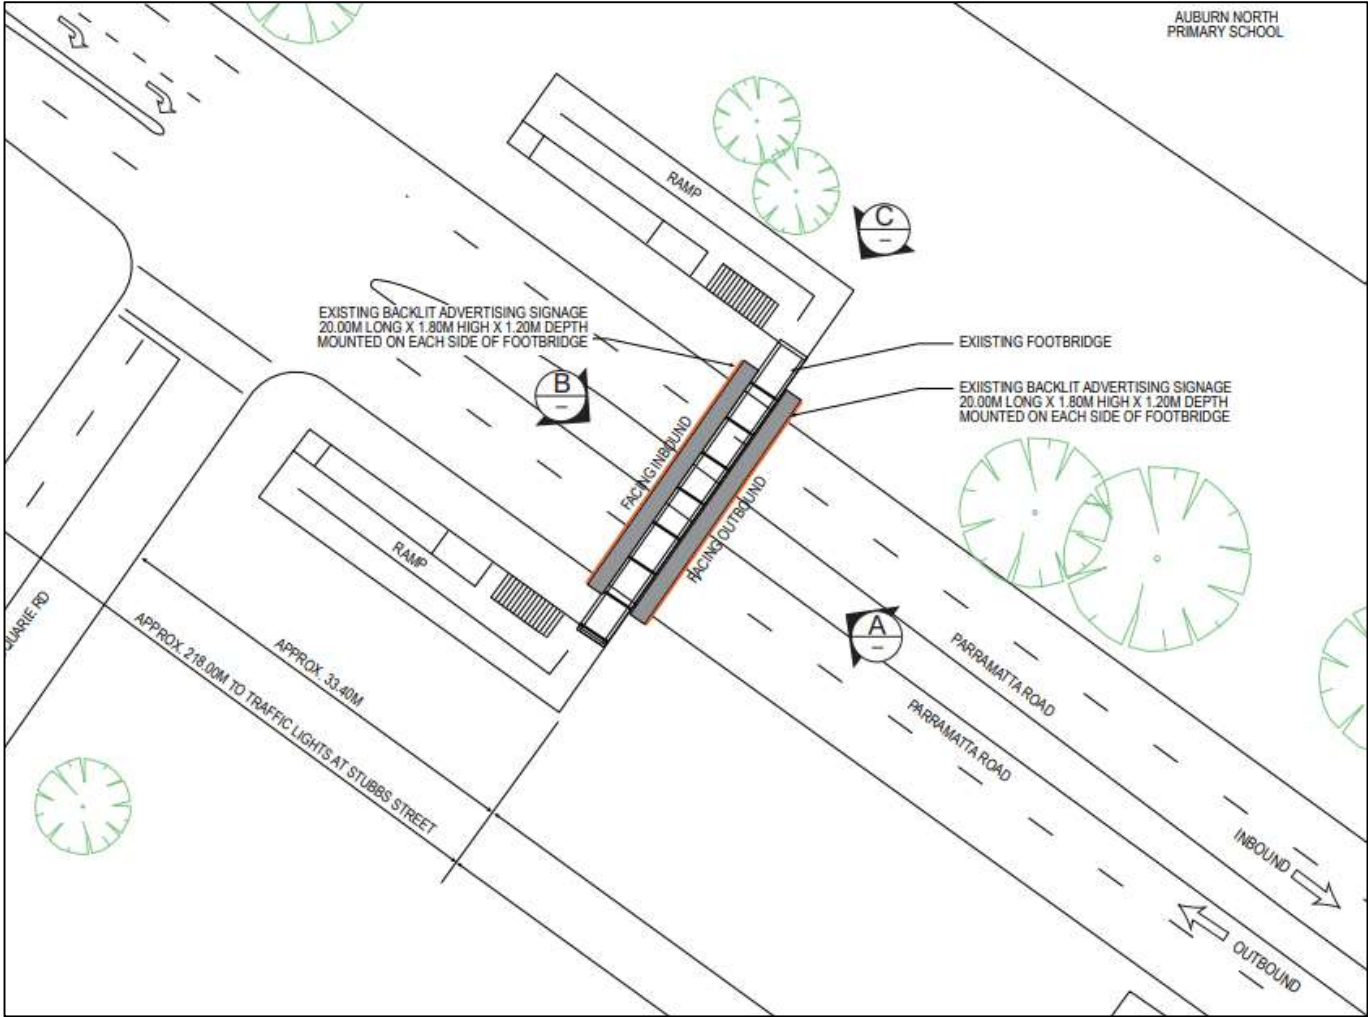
| Site context (source: revised architectural drawings 27/05/24)
